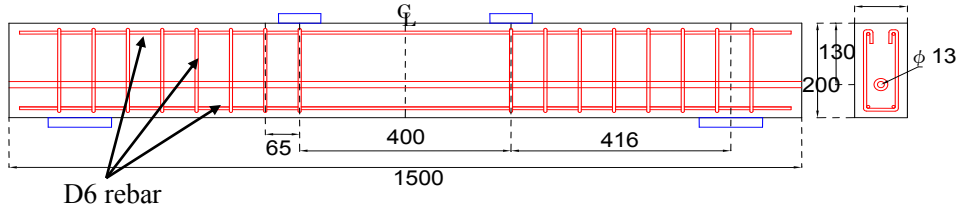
Beam of A series (Designed failure mode: Flexural tension failure, unit: mm)
